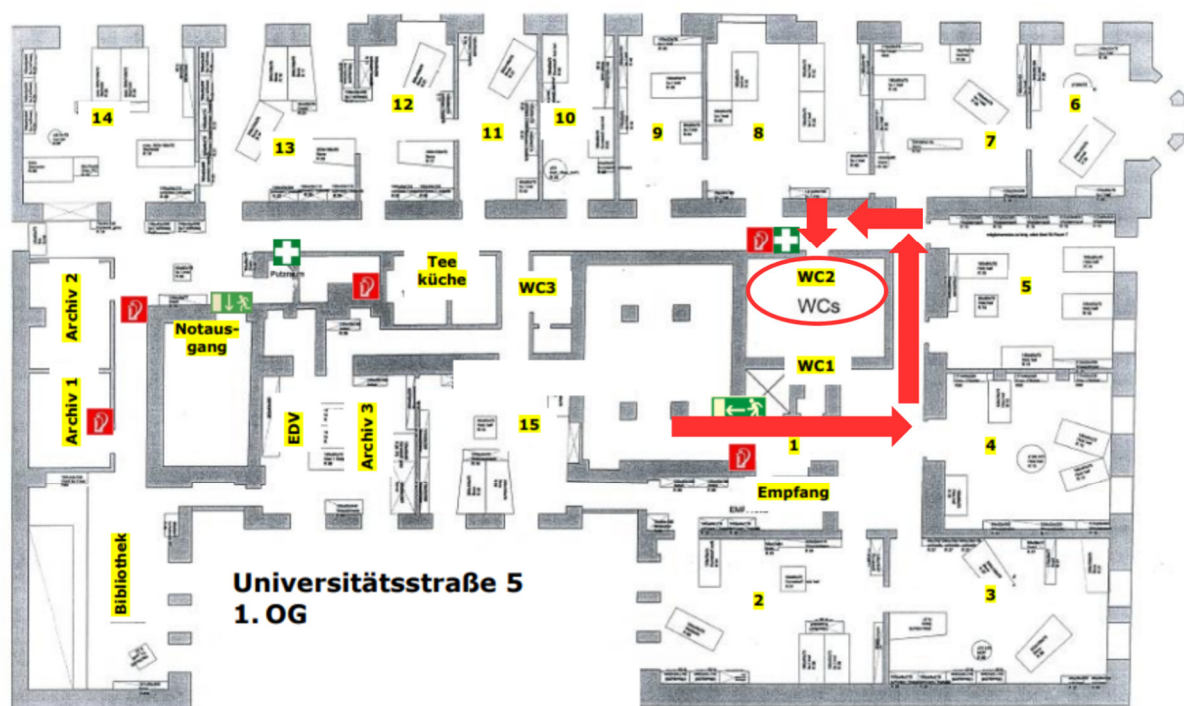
Floor plan of Universitätsstraße 5, 1<sup>st</sup> floor, non-accessible toilet
